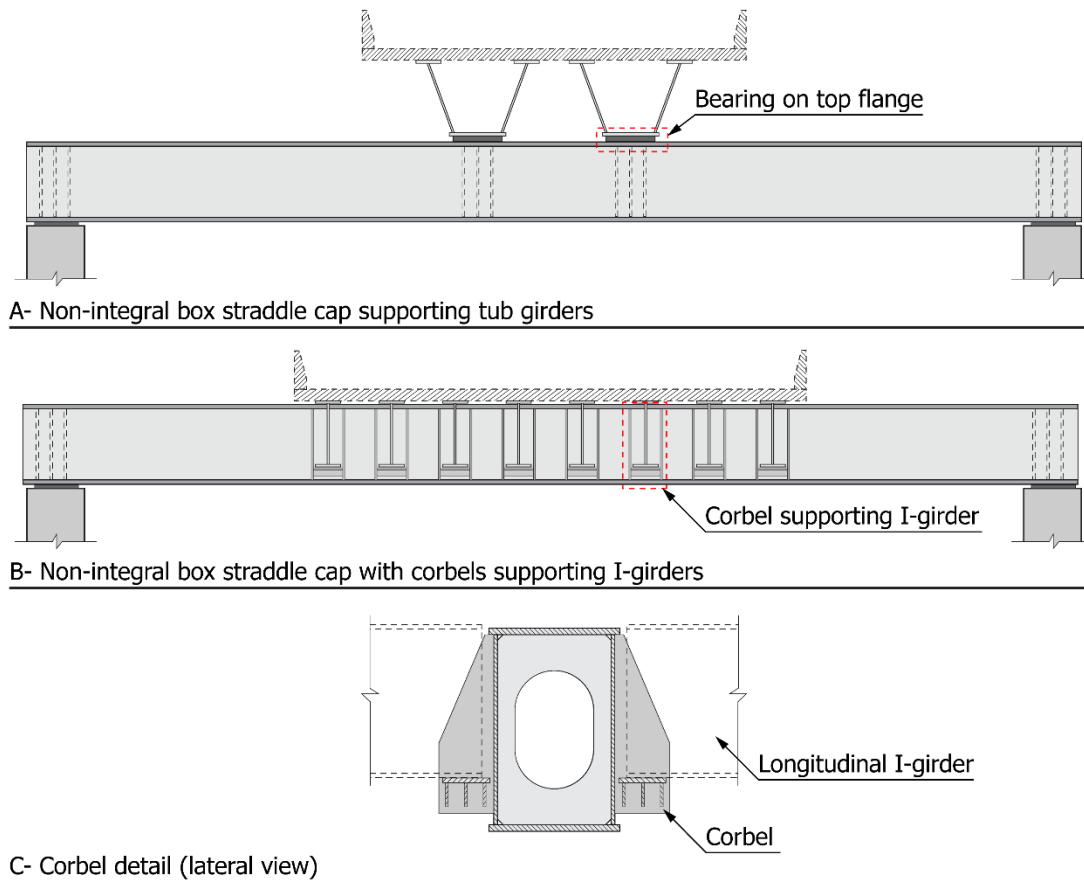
Non-integral steel box straddle caps; (A) Tub girders on bearings on the top flange; (B) Multiple I-girders supported by corbels; (C) Corbel detail. Adapted from TxDOT drawings.
